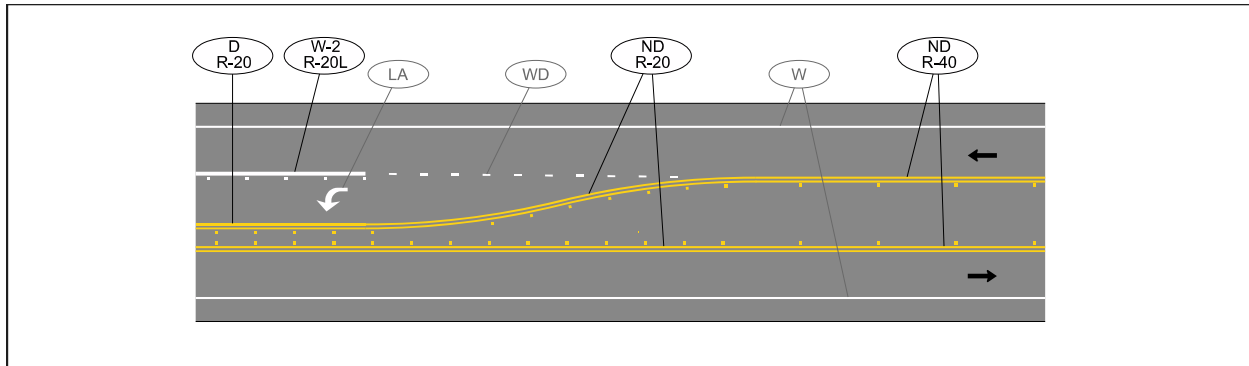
A: Typical Narrow Median Left Turn Lane Layout with RPMs
